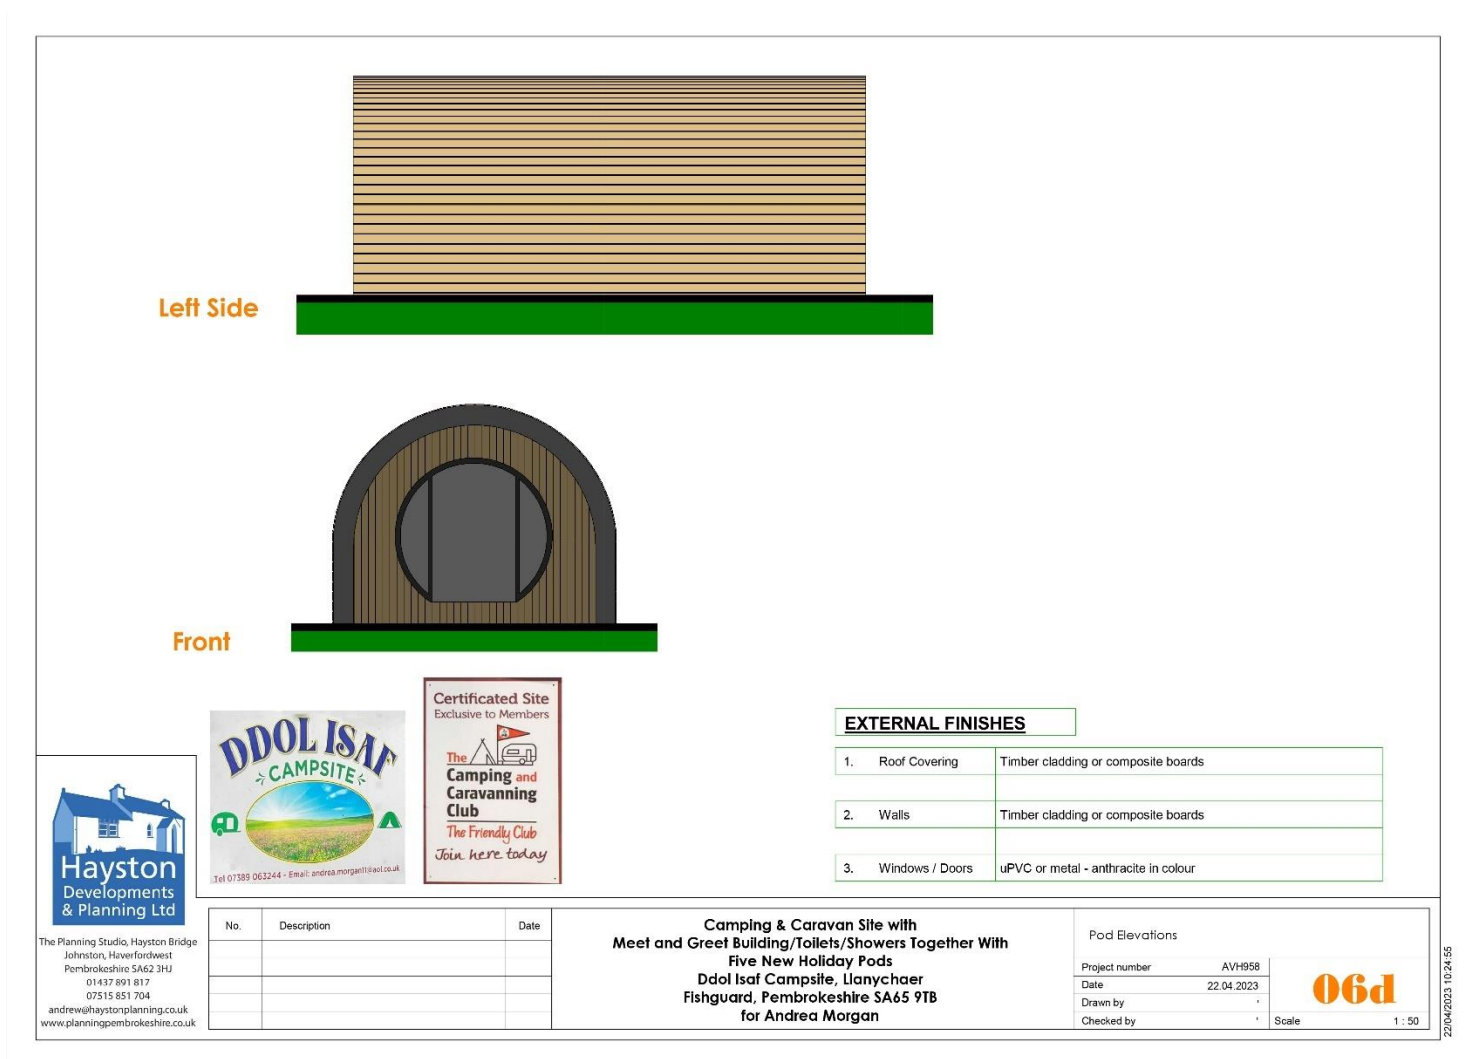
Proposed design details for the camping pods. Plan provided by the client, not reproduced to scale.
